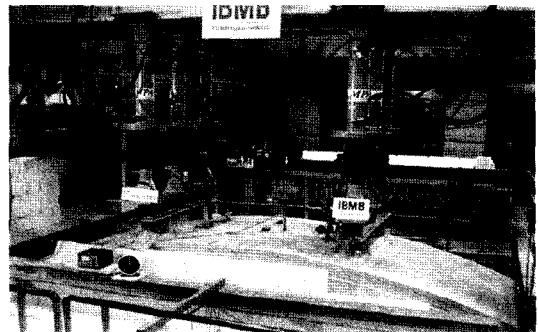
Full-scale fire test with recently developed fire proof concrete at the TU Braunschweig, Germany
